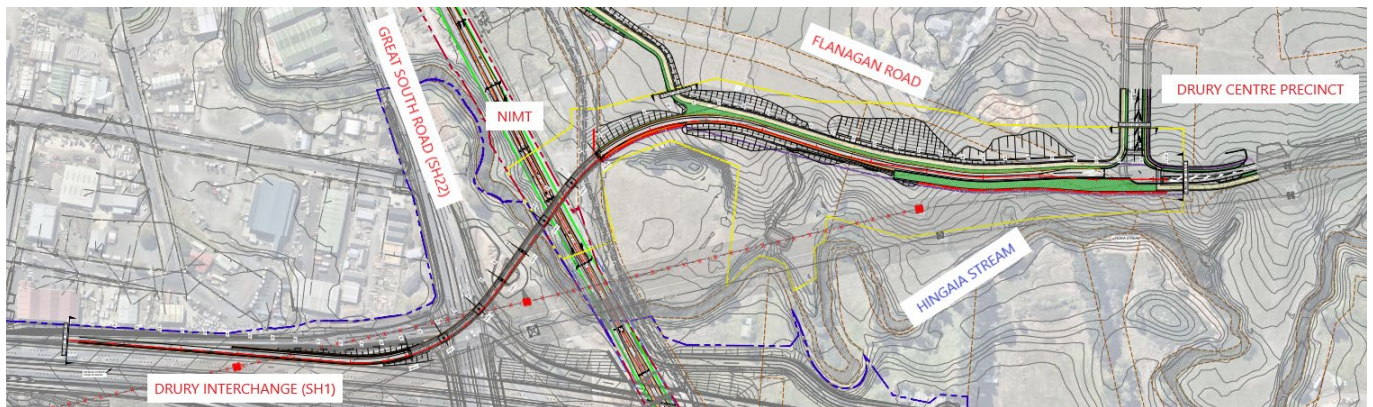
Indicative location plan of the proposed Drury Access Ramp
